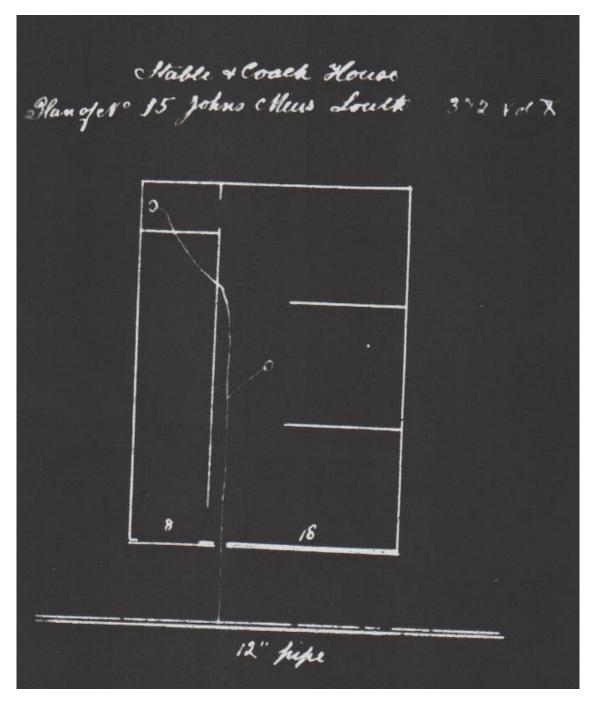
The ground plan of 15 Johns Mews in 1854 (Camden drainage records)
